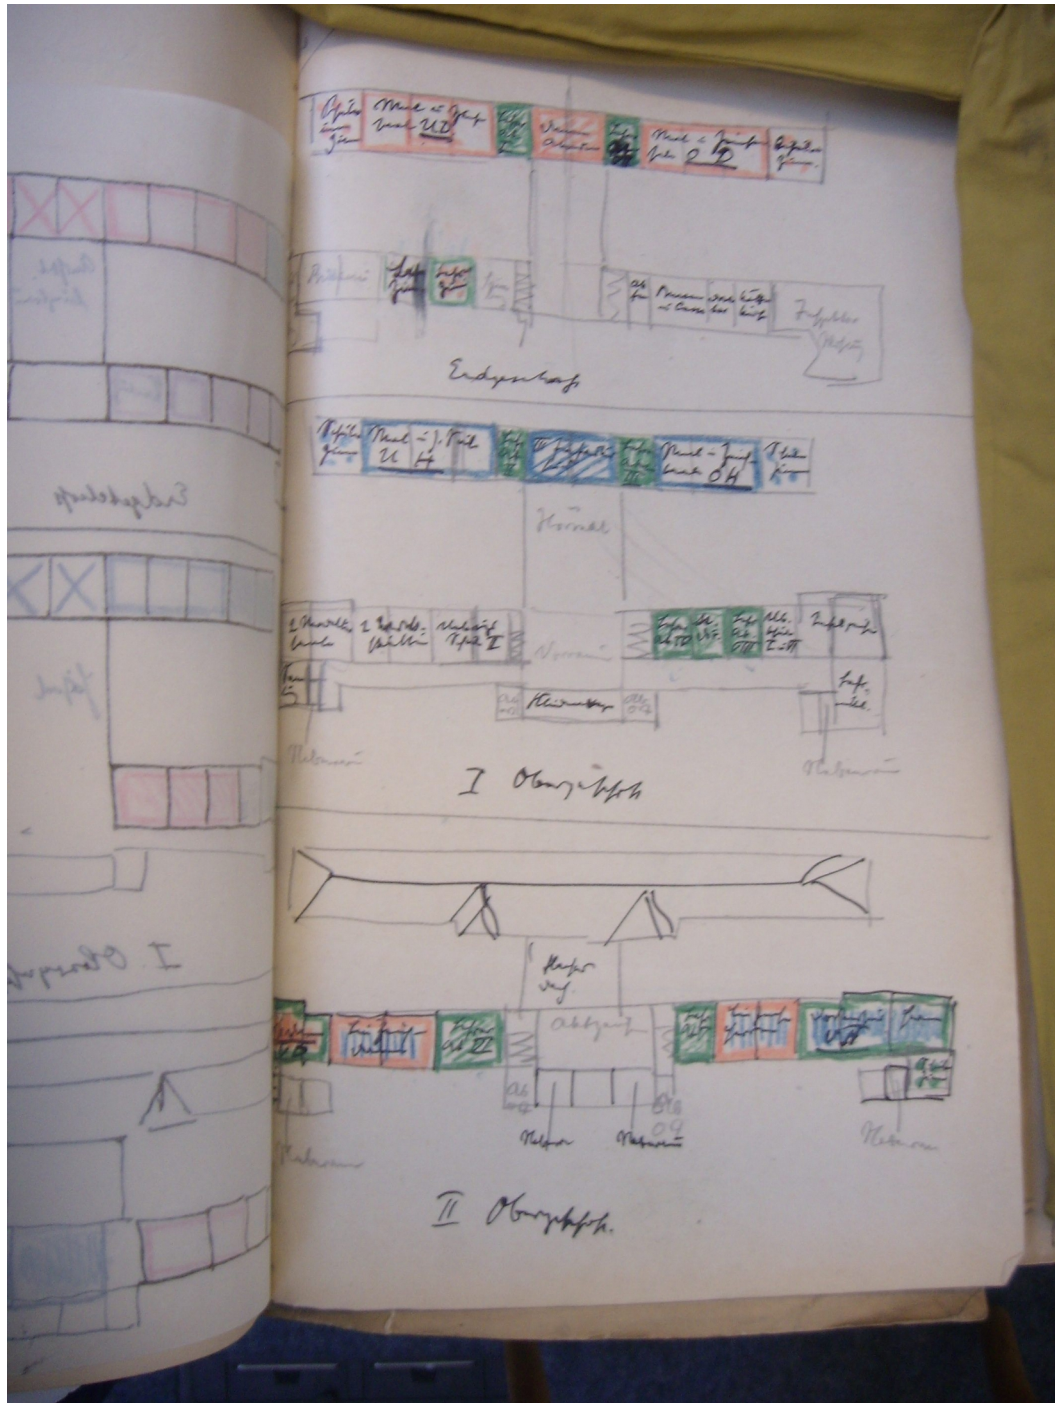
Sketch of ground plan of building of State Art School Berlin, 1914 (Universität der Künste Berlin, Universitätsarchiv, Bestand 9, Nr. 12.)
